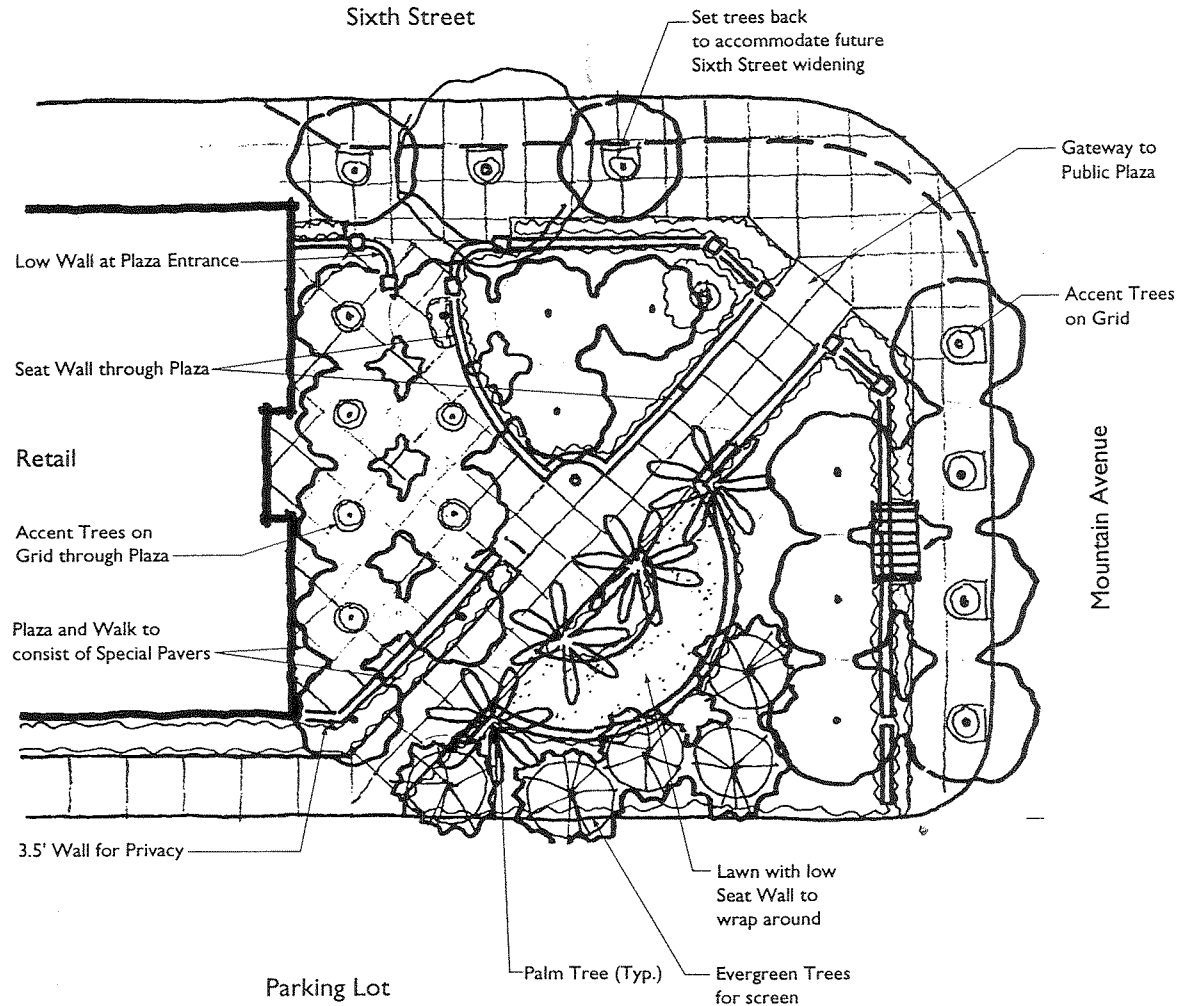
, Gateway Plaza at the southwest corner of Mountain Avenue and Sixth Streets. The Gateway Plaza on the southeast corner is symmetrical and should be largely identical.
